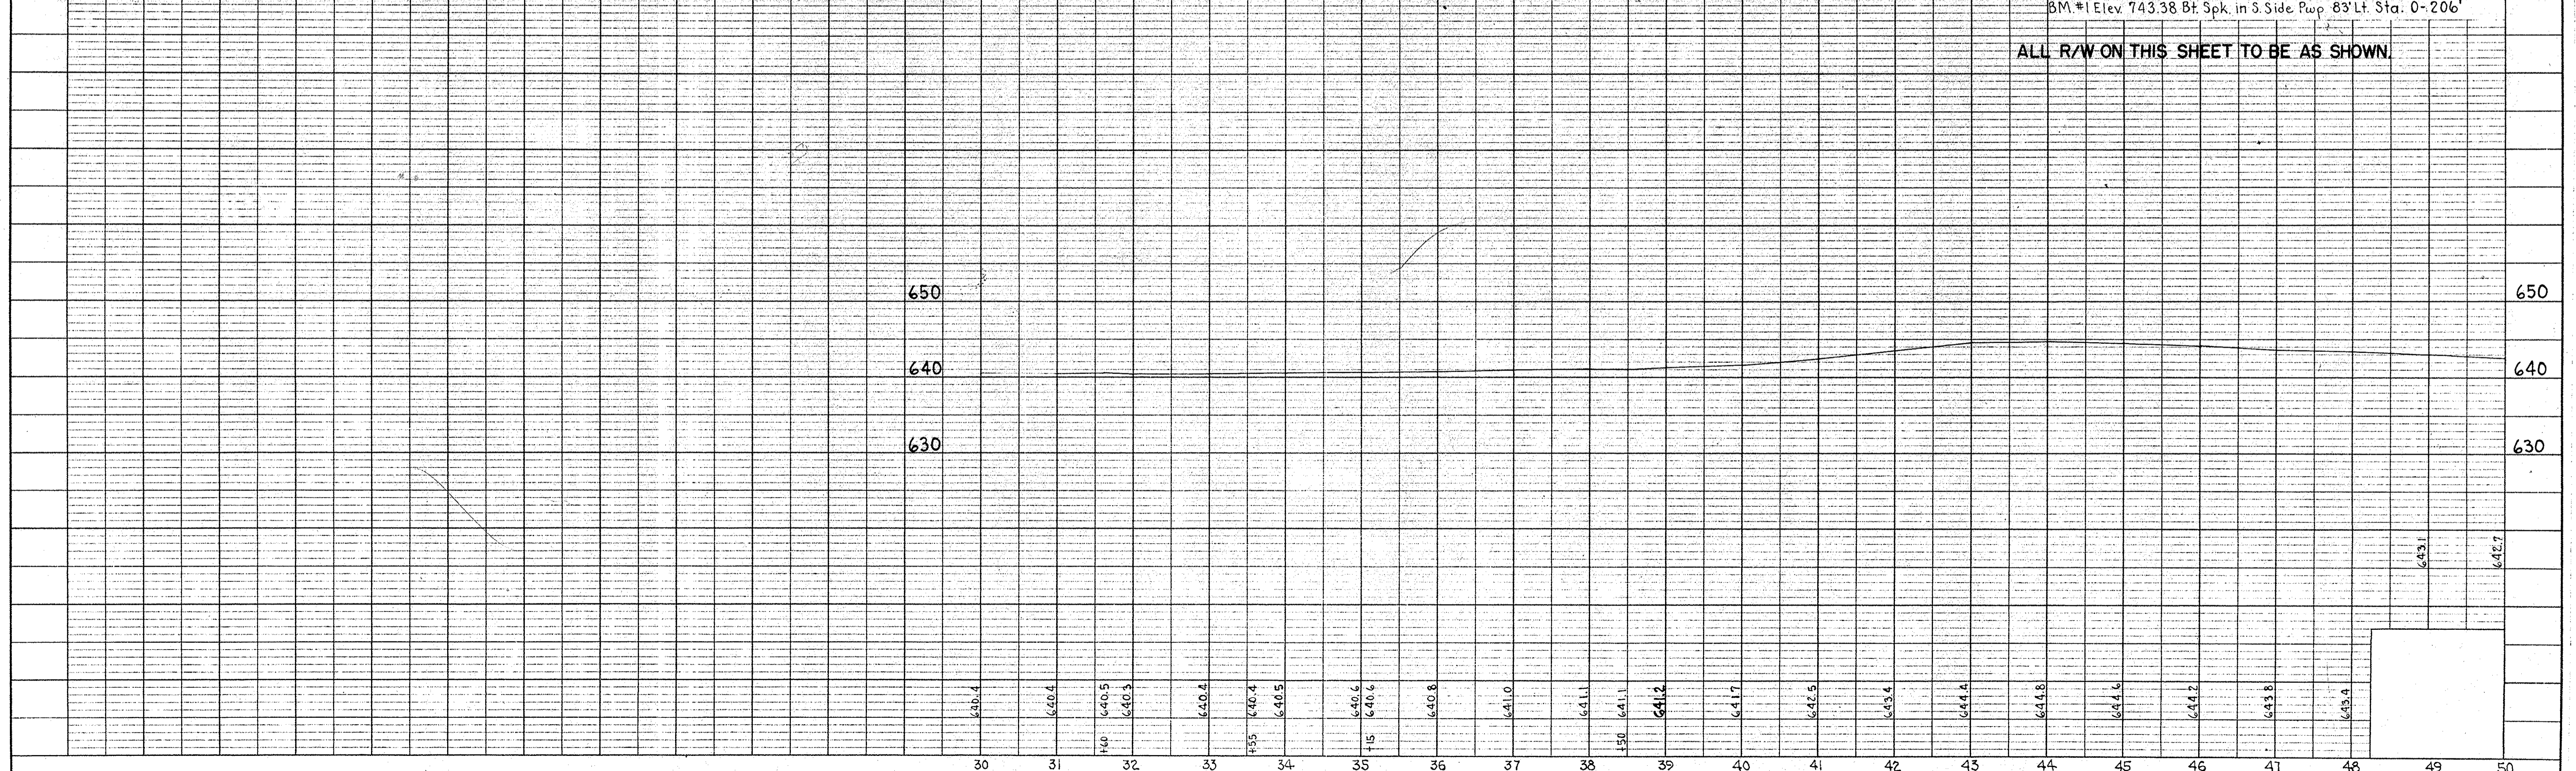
PLAN - PROFILE B. R. B. STANDARD
